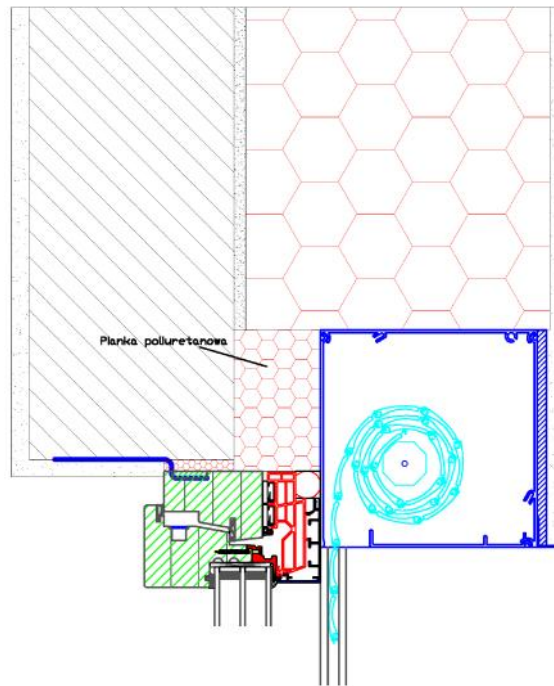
An exemplary detailed view of the assembly of a window with external blinds
